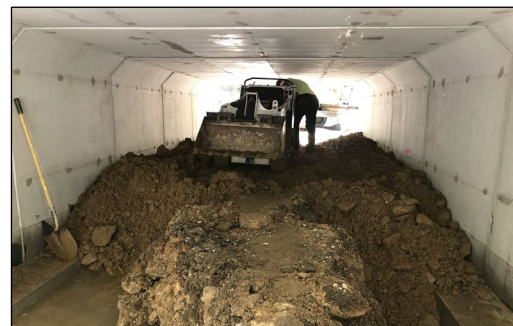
Placing fine material inside a bottomless concrete culvert with walk behind skid steer.
